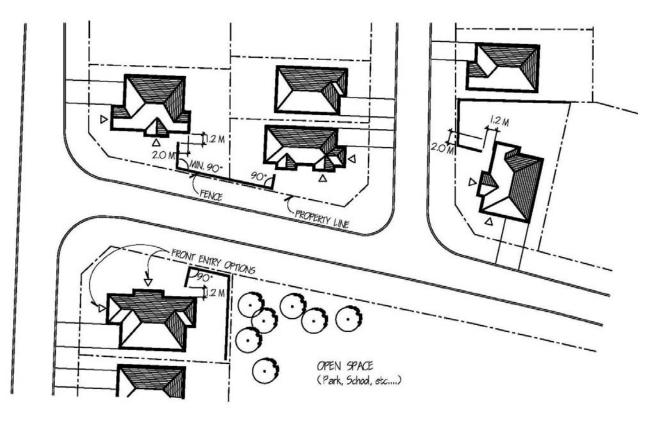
Typical Privacy Fence Layout Plan
